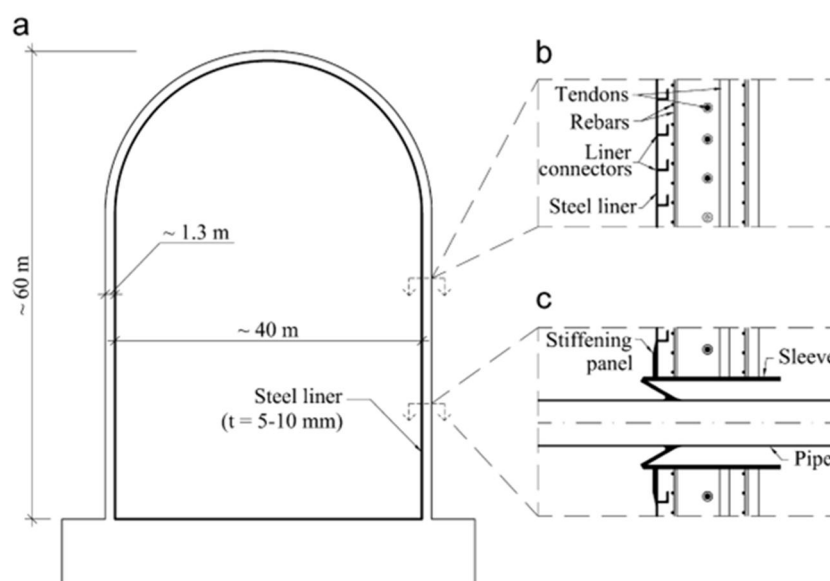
Principal sketch of a prestressed concrete containment with steel liner. (a) Vertical section, (b) Horizontal section and (c) pipe penetration horizontal section. [18, p.1]
